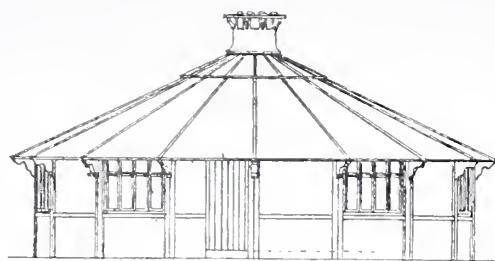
REINFORCED CONCRETE COTTAGE.
